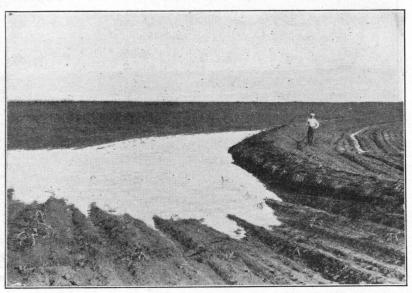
Water impounded above terrace across a gully. Where the terrace embankment is not sufficiently wide seepage through the terrace often results in washing out terrace embankment
